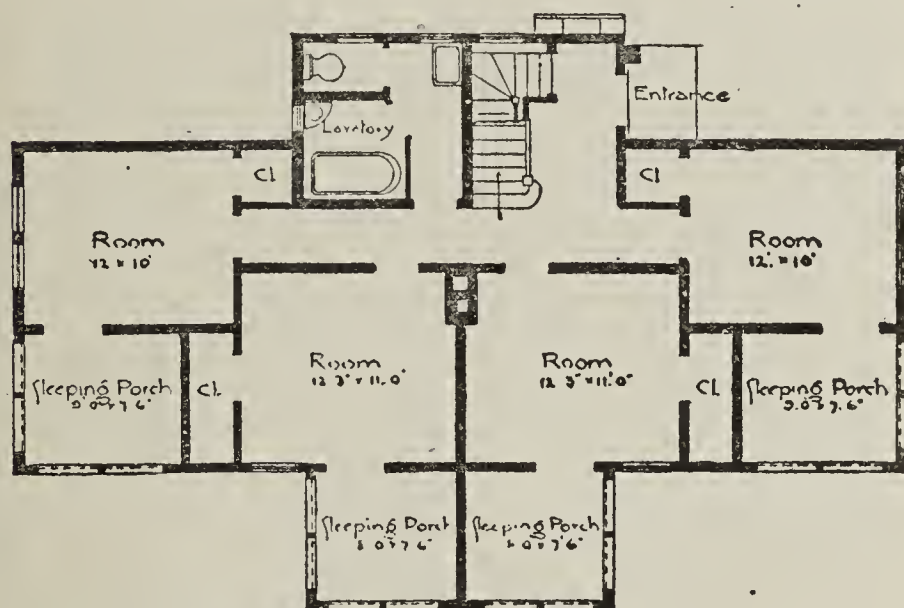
Typical floor plan of a two-story, eight-room cottage. There are a toilet and bath on each floor, and a closet and sleeping porch to each room.
